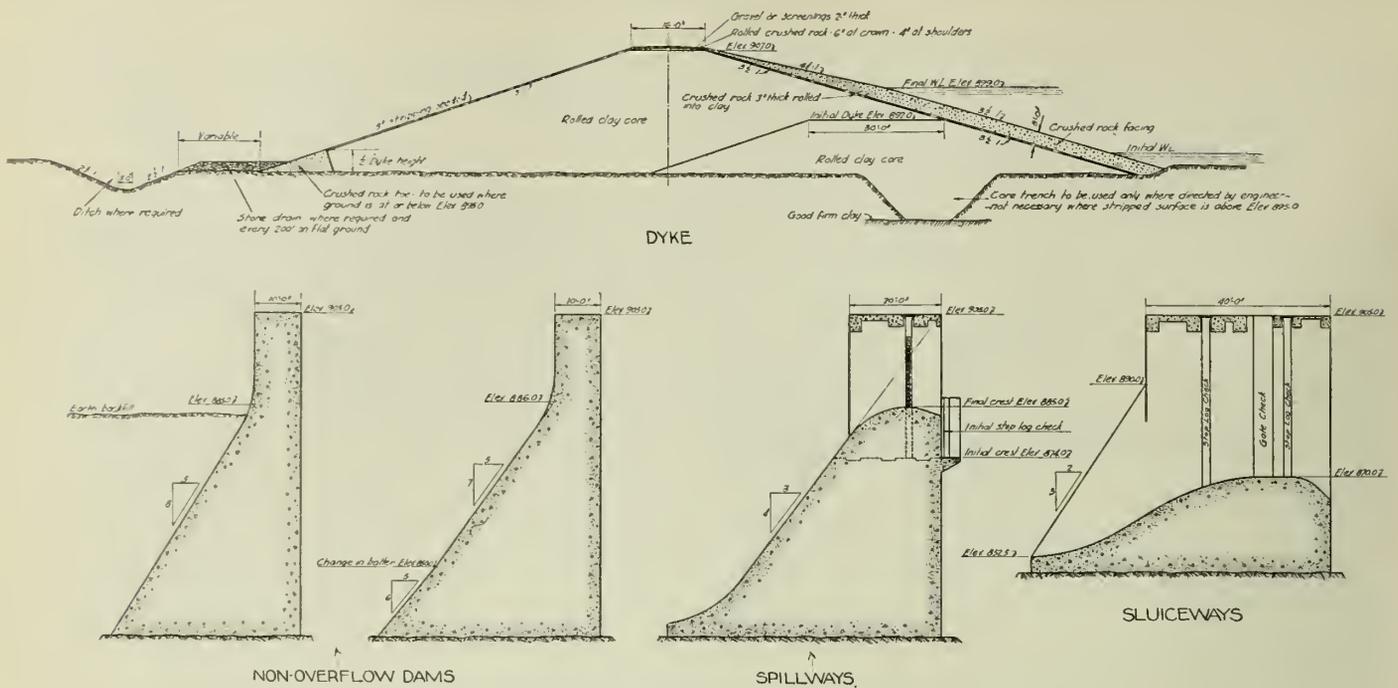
Typical Sections of Dykes, Dams, Spillways and Sluiceways.
